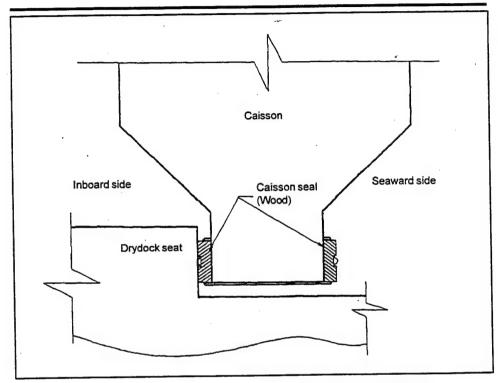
Plan view of drydock seat and caisson seal interface.
